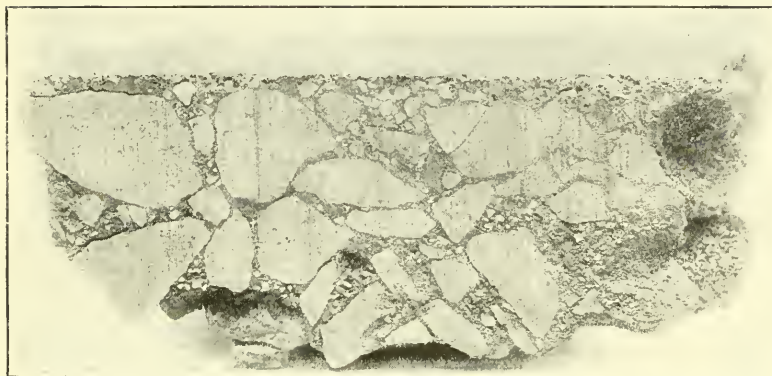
SEC. 11.—BITUMINOUS PAVEMENT, BUILT BY BARRETT MANUFACTURING COMPANY, USING PENETRATION METHODS. KNOWN AS "MODERN PAVEMENT."
